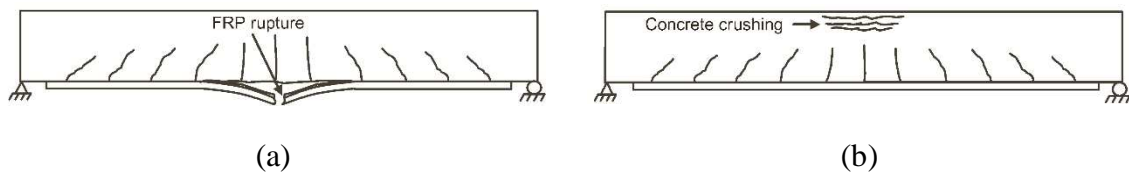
Flexural failure of FRP strengthened beams at critical sections (a) FRP rupture, and (b) concrete crushing, [17].
